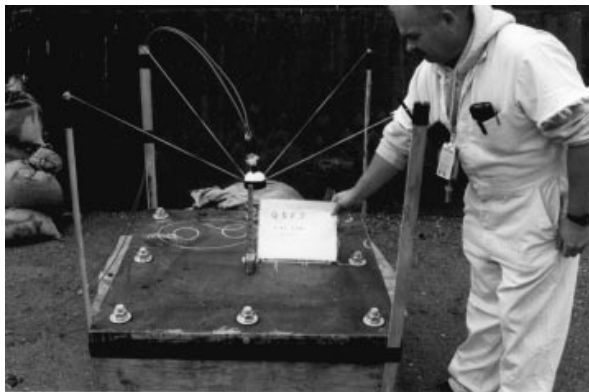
1/4-scale floor section prior to testing at the 25% explosive weight level.
